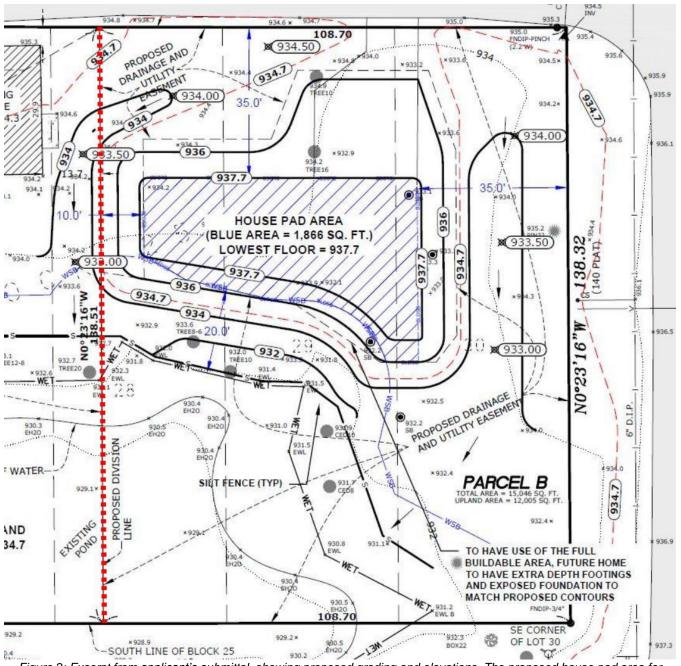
Excerpt from applicant's submittal, showing proposed grading and elevations. The proposed house pad area for Parcel B is shown in blue. Proposed lot split line is shown in red.
